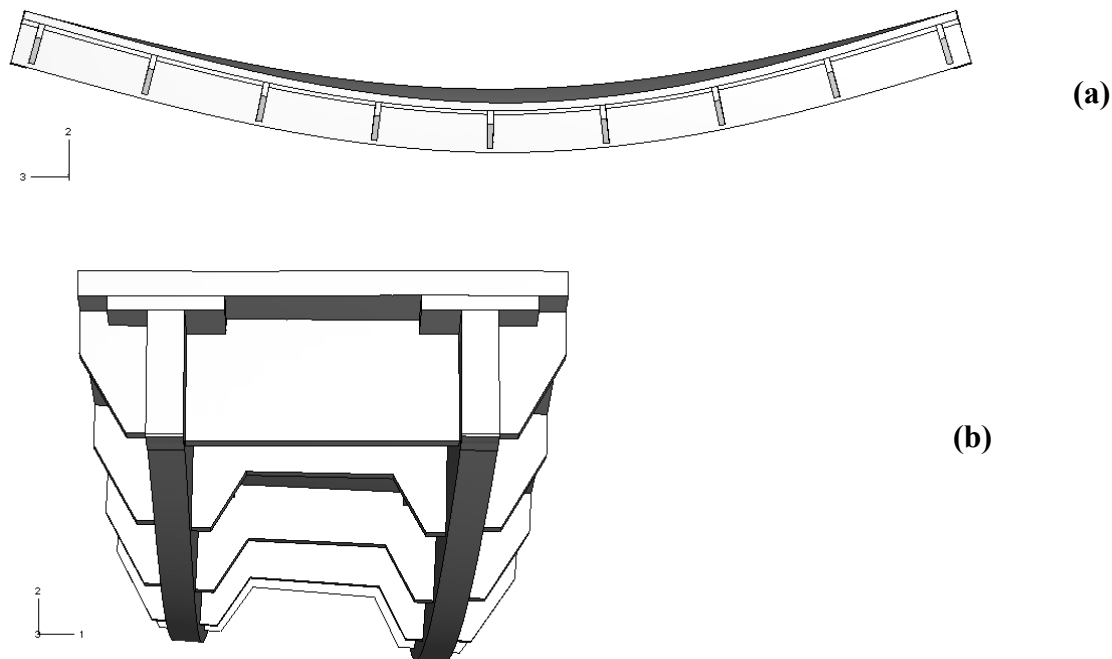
Side view (a) and frontal view (b) of the deformed shape of the bridge in load combination 2
